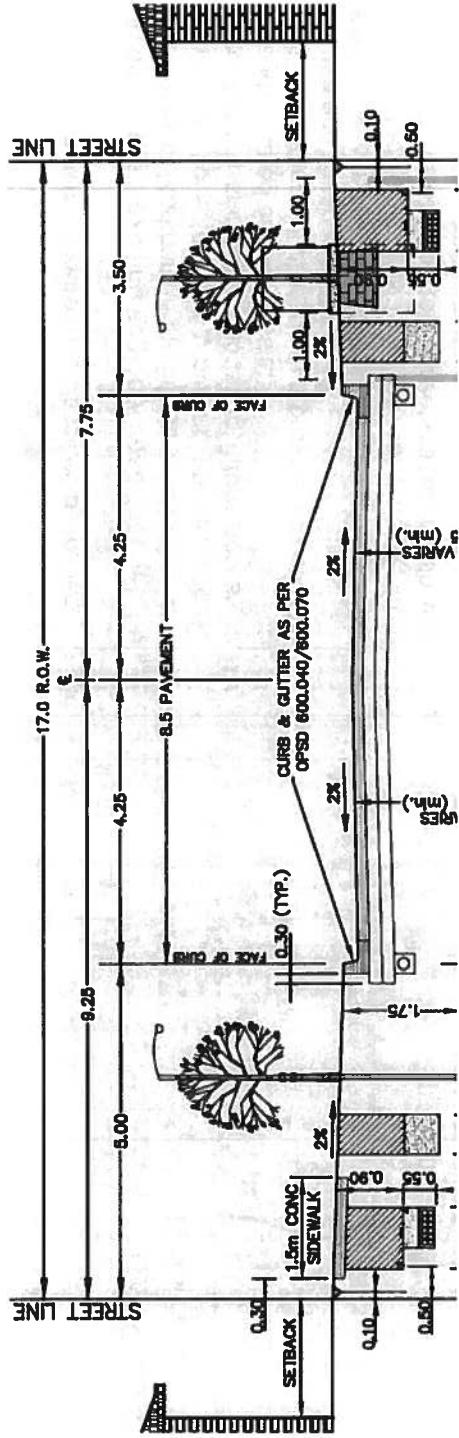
City of Markham Typical Street Cross-Section for 17.0m Local Road
